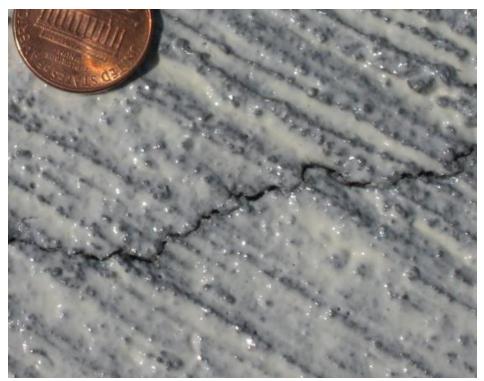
Cracks forming before the application of curing compound. Note liquid compound around crack edges. Markham Ravine Bridge.
